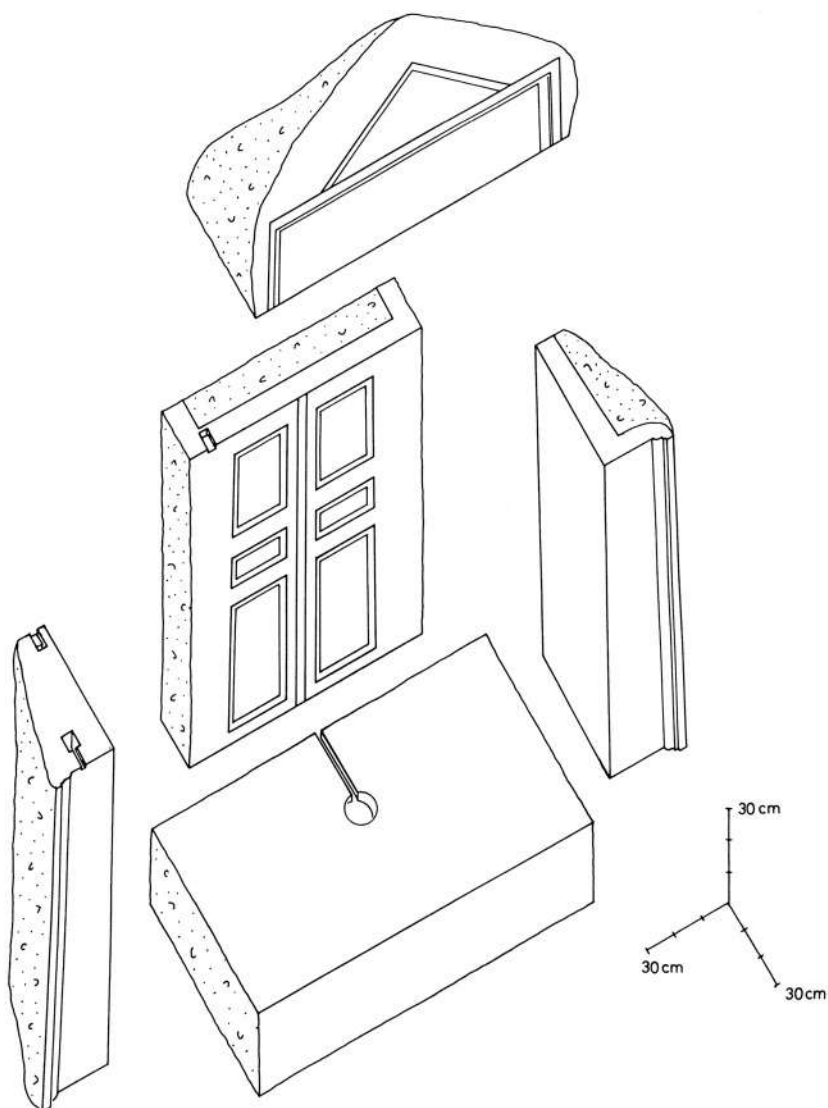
Aizanoi. Reconstruction of a 'built' doorstone (after K. Jes).
